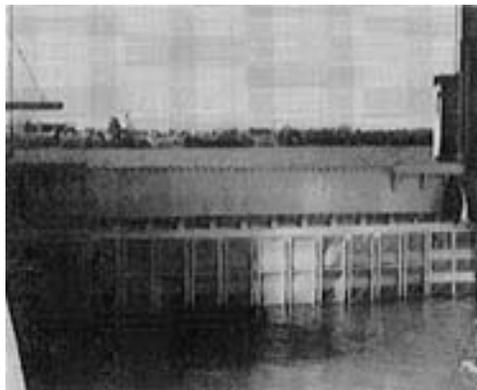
Stainless steel flap leaf installed at Red Bluff Diversion Dam.
